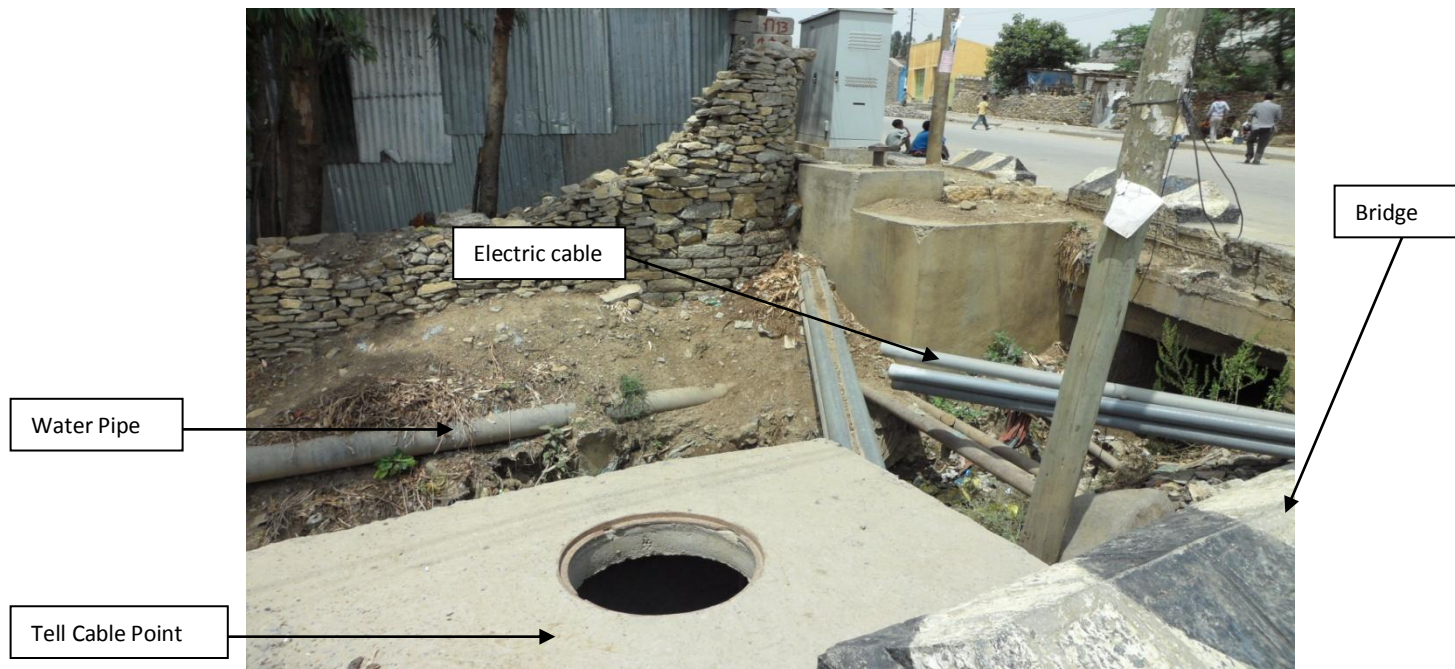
Connection Point: Bridge, Pipe Line, Tell & Electric Cables
